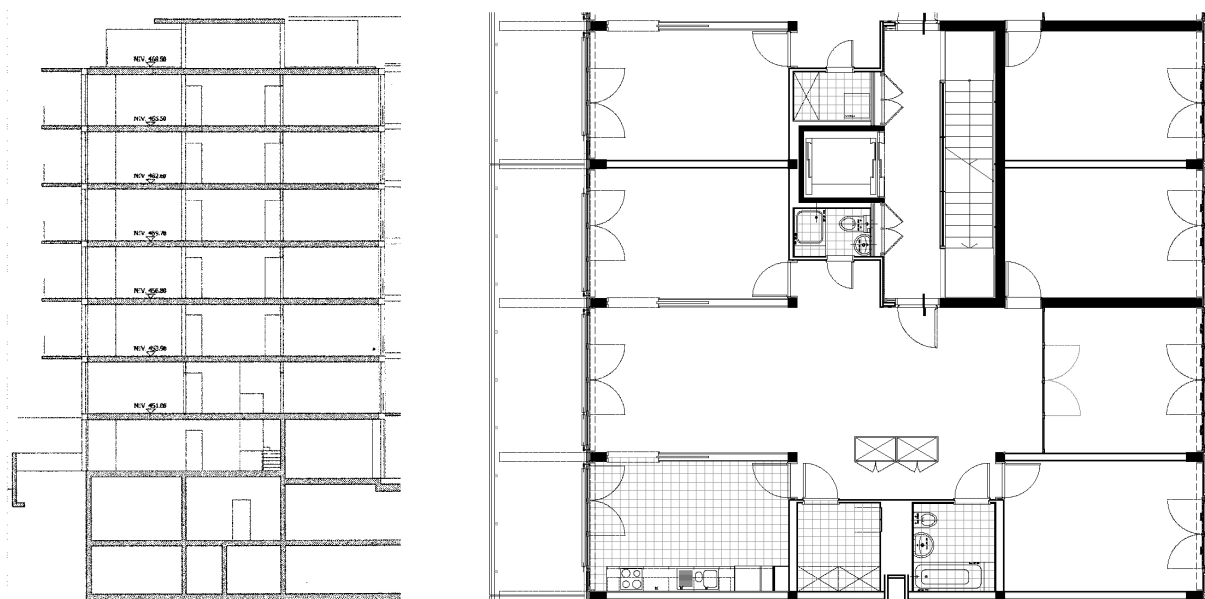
Longitudinal view and typical floor plan (Giacometti).
